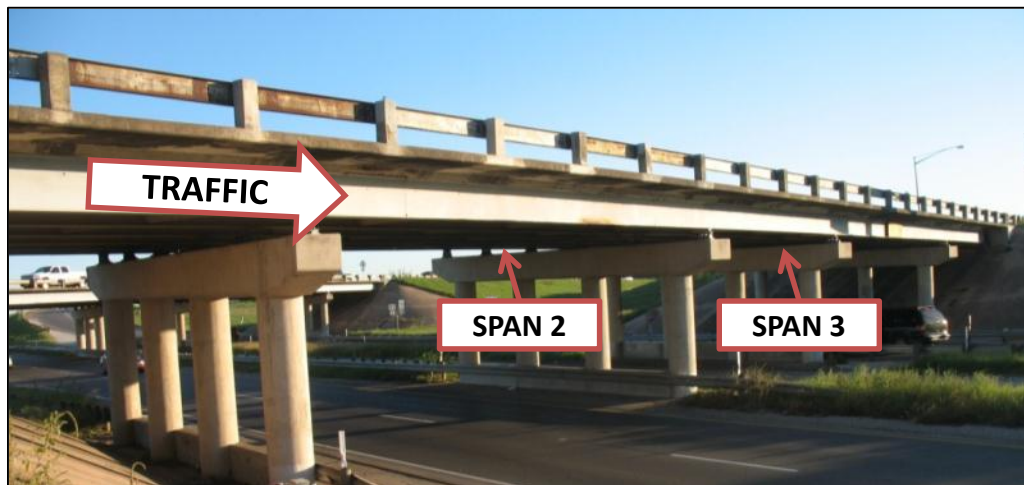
TX-71E Bridge showing instrumented spans 2 and 3.
